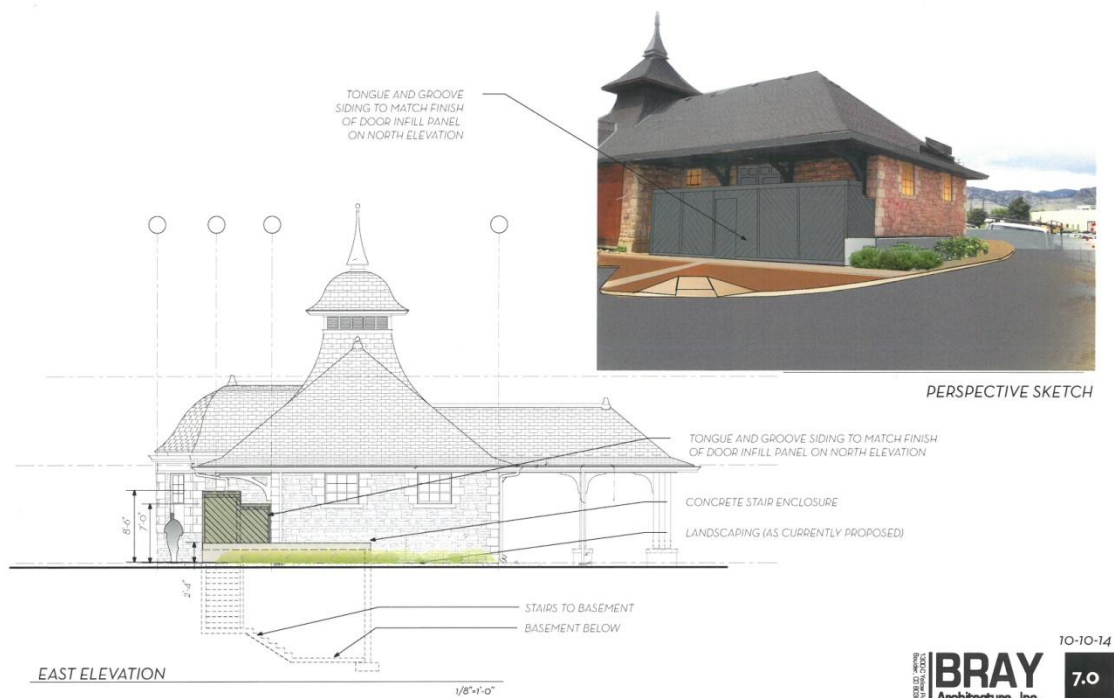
Proposed East Elevation and Perspective Sketch, 2014.
